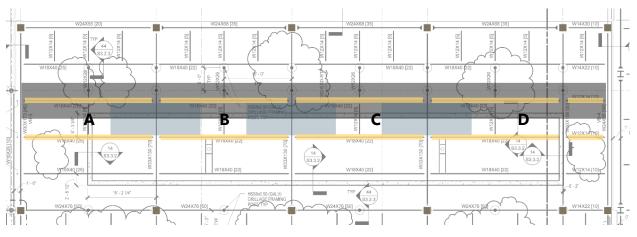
Altered Layout with Beam Tributary Areas Highlighted
